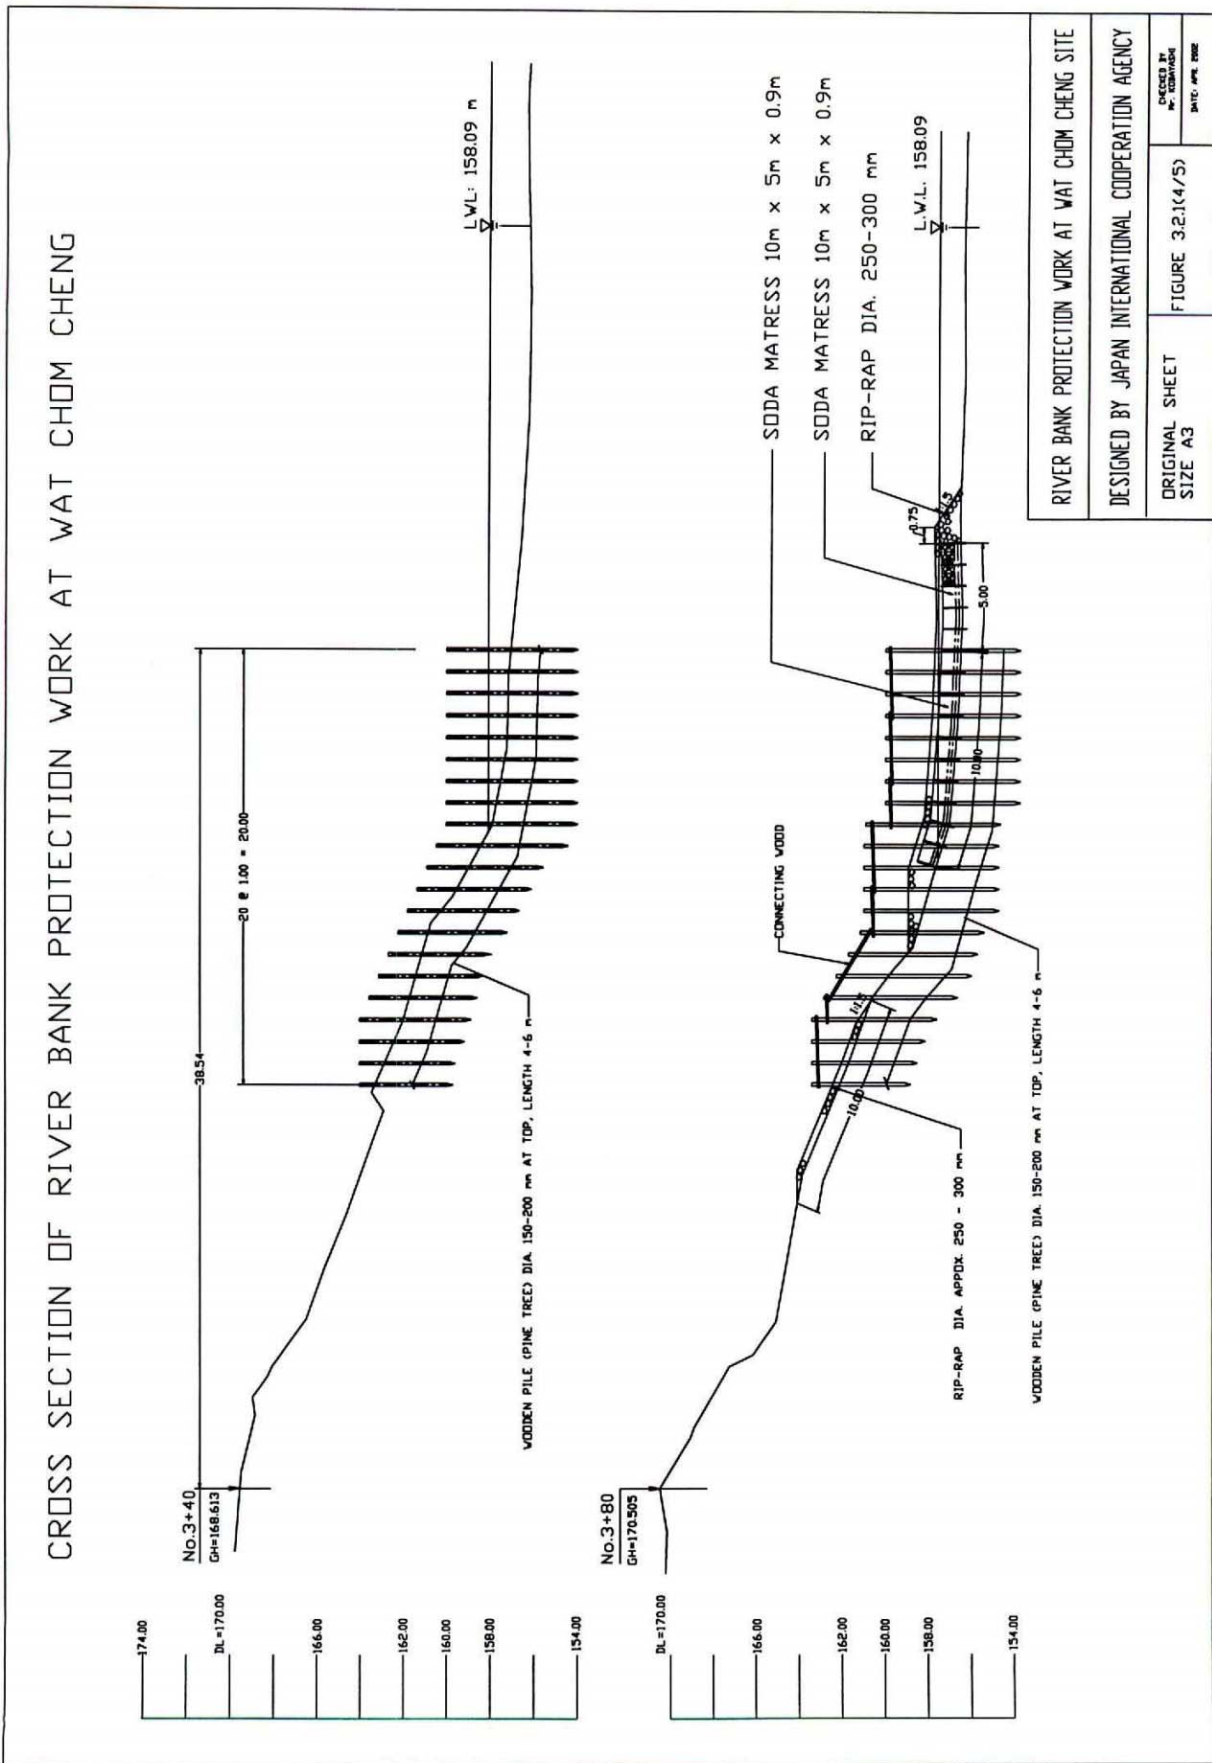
(3/3) Cross Section of River Bank Protection Work at Wat Chom Cheng Site
